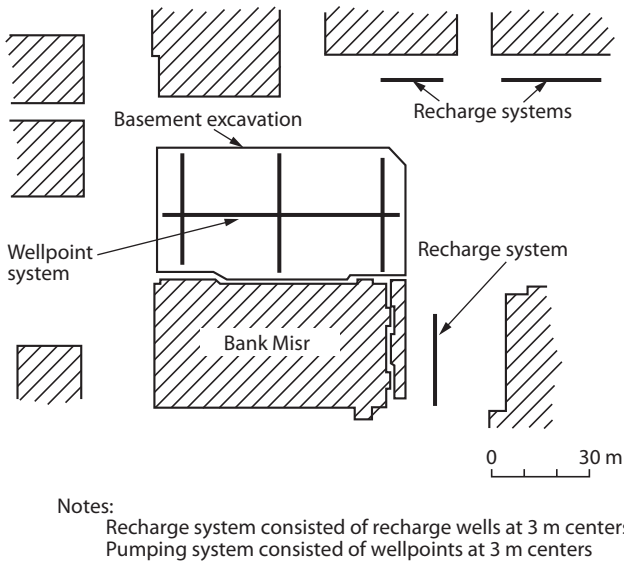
Bank Misr, Cairo: plan layout of dewatering and recharge system. (Based on Troughton, V.M., *Groundwater Effects in Geotechnical Engineering*, Hanrahan, E.T., Orr, T.L.L., and Widdis, T.F., eds., Balkema, Rotterdam, 1987, pp. 259–264.)
